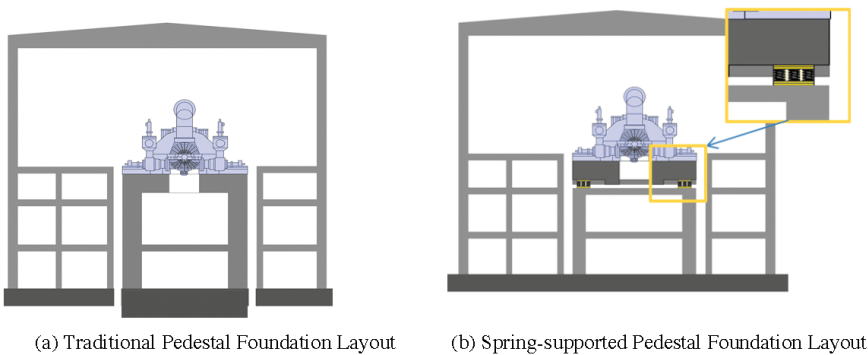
Typical cross section of machine buildings, without and with VIS; (a) traditional pedestal foundation layout; (b) spring-supported foundation layout
